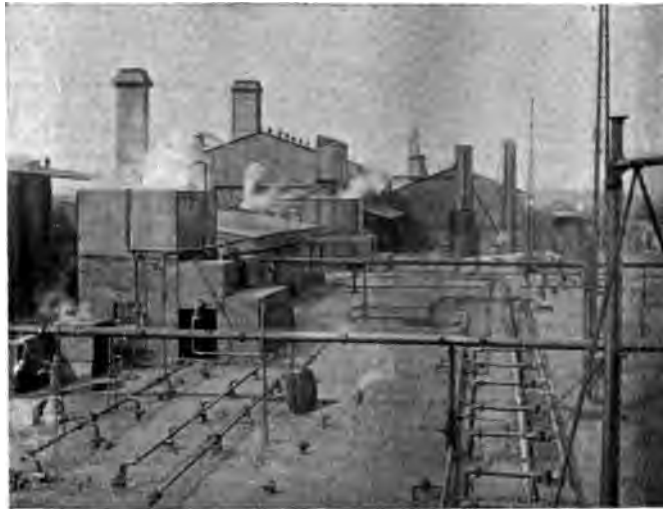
PIPE CONNECTIONS TO UNDERGROUND STORAGE-TANKS.
